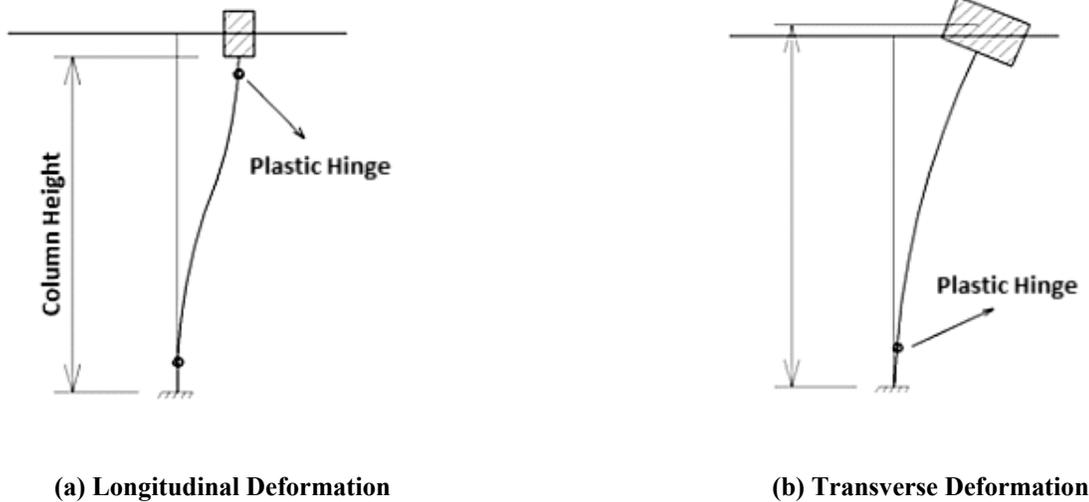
Deflected shape of pier column in longitudinal and transverse directions.
